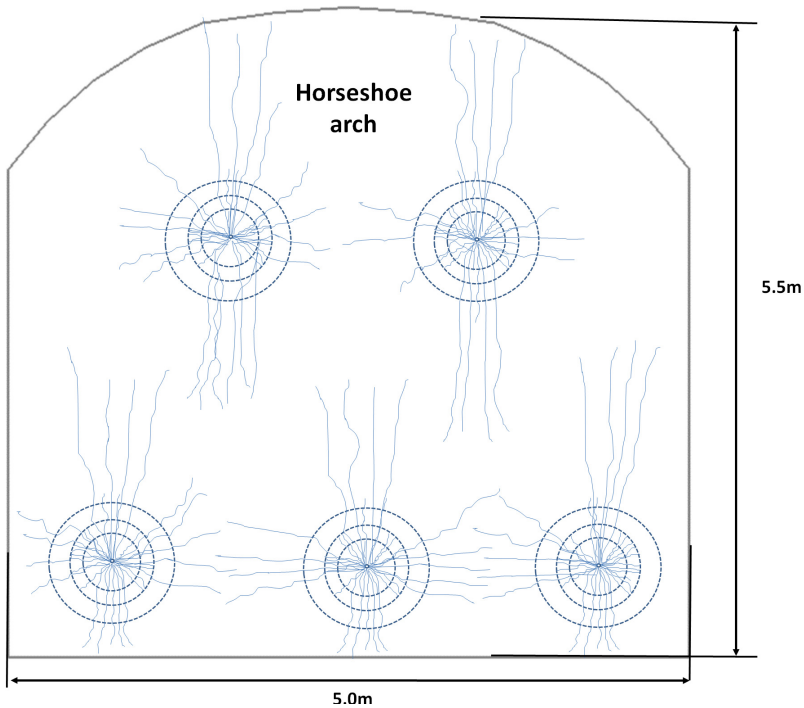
Fracturing on the mining face during five drilled and blasted preconditioning holes pattern
